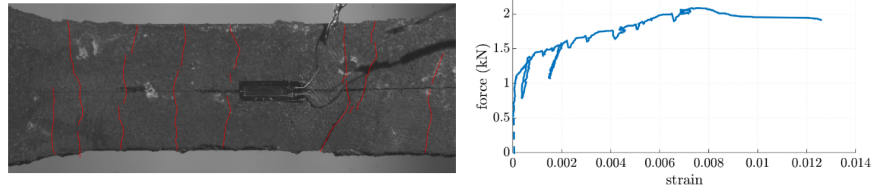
Direct tension test of anisotropic concrete specimen: Video capture of the test specimen at ultimate state showing multiple cracks highlighted in red, Force-strain graph depicting strain-hardening behaviour. Curve jumps are linked with cracking phenomena [18].
